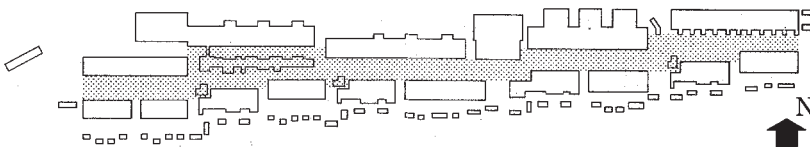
Layout plan, Gårdsåkra. (Lange, 1986).
